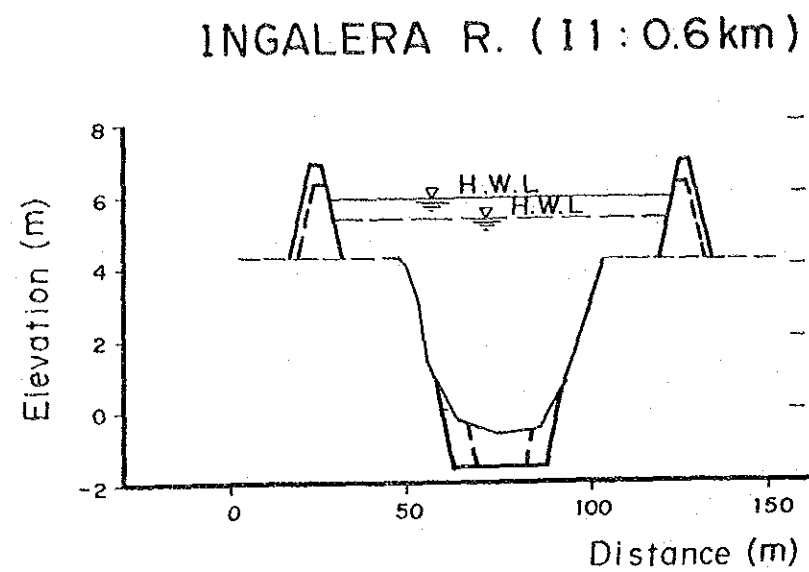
TYPICAL CROSS-SECTION OF INGALERA RIVER
